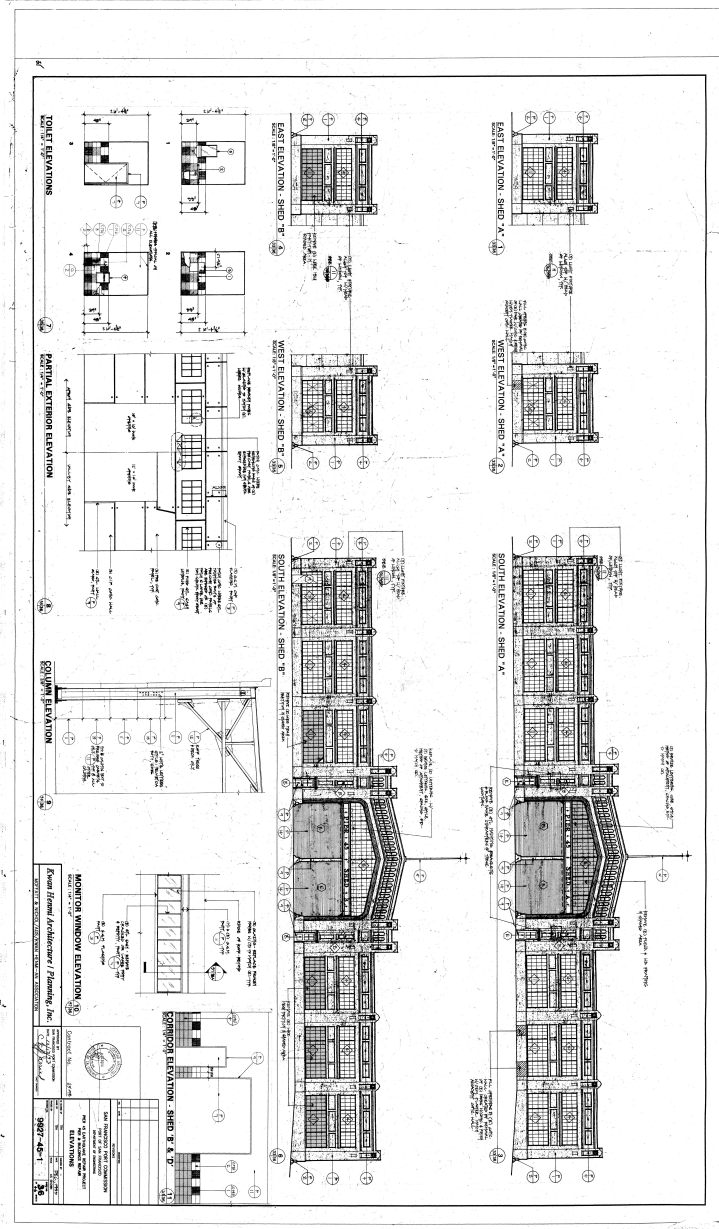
Typical details of east and west elevation walls for Sheds A and B.
